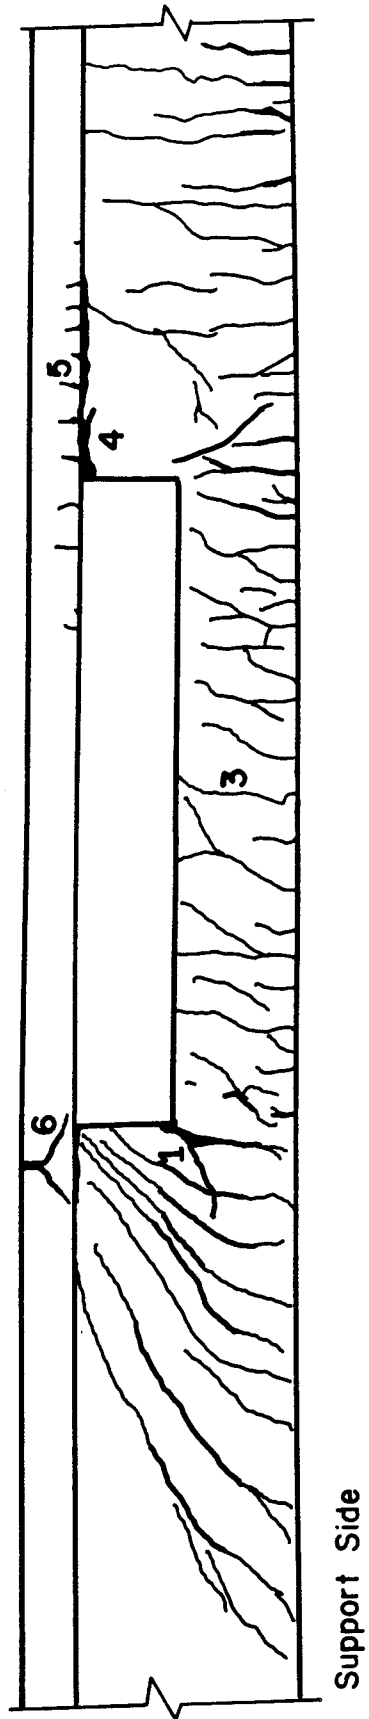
Crack Pattern - BEAM B1.
